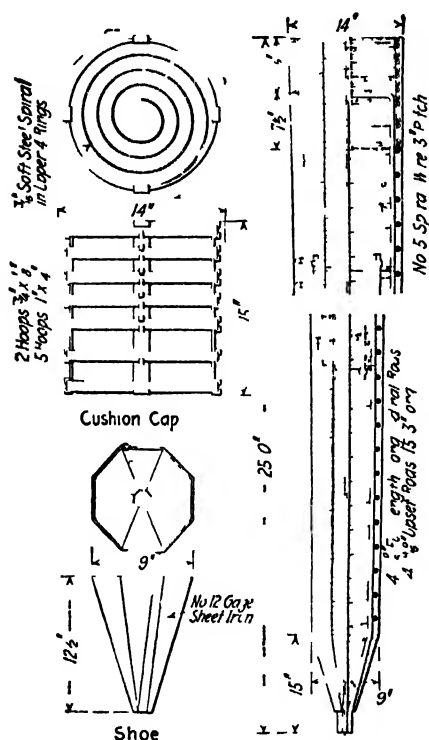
Reinforcement of Cummings Concrete Pile
